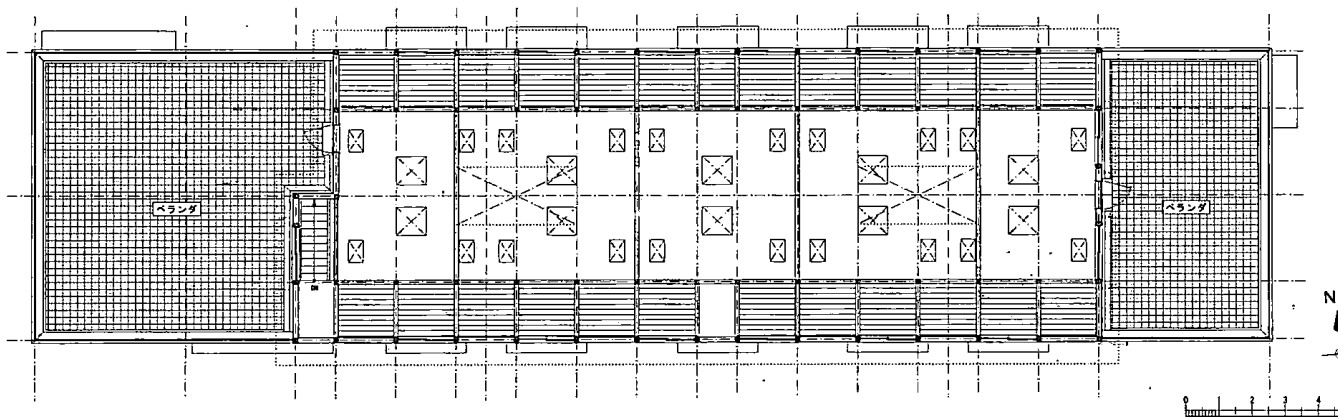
Second floor plan of the Sericulture Experiment Laboratory.
